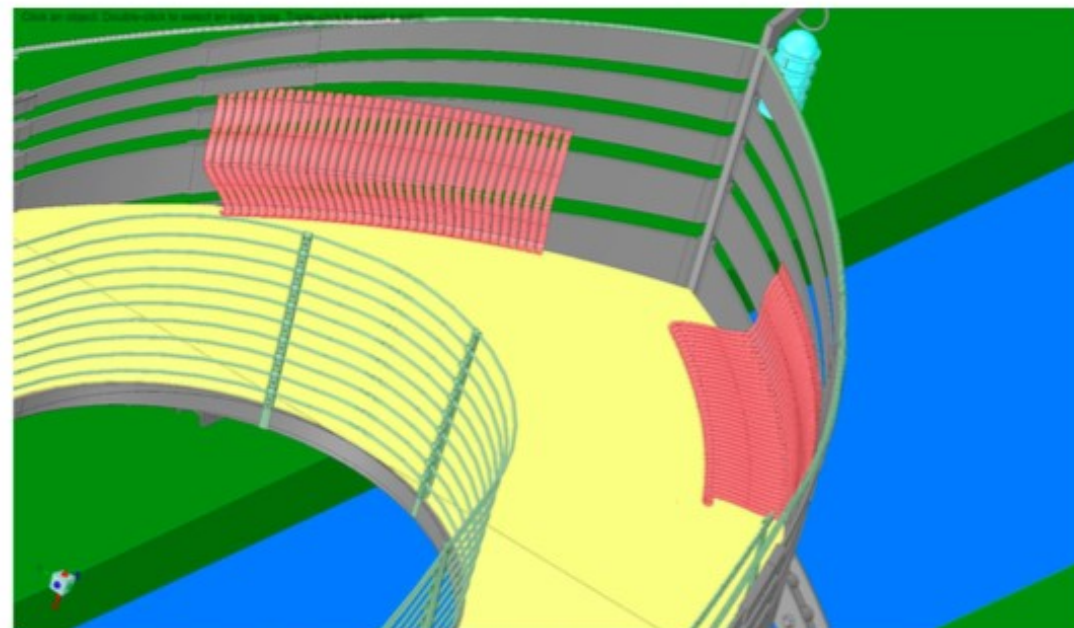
Possible seating setup on the upper deck of the bridge, looking back towards Ellesmere. A lantern, suspended from the stem, is visible in the background.
